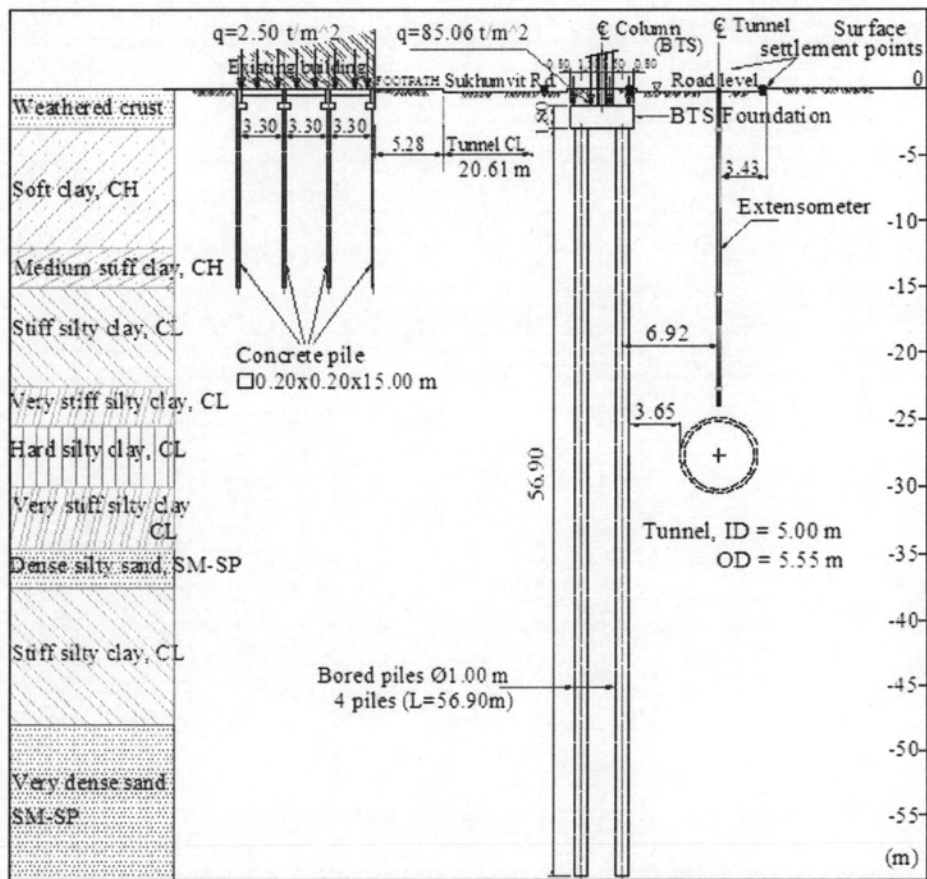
Subsoil profile at BTS-Sukumvit area and cross section (section BB)
